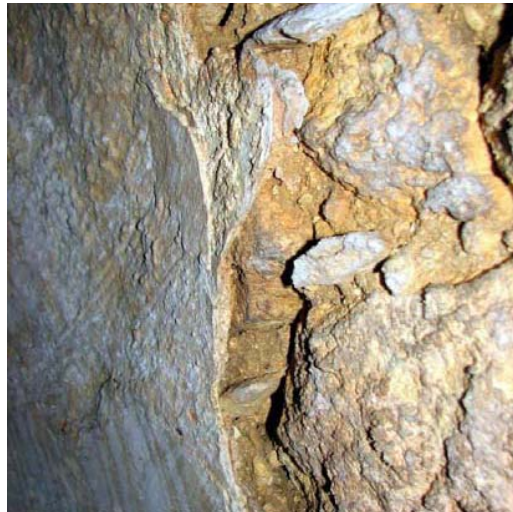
Detail of white-washed mortar rendering applied to the dry-stone walls in the apse area.
